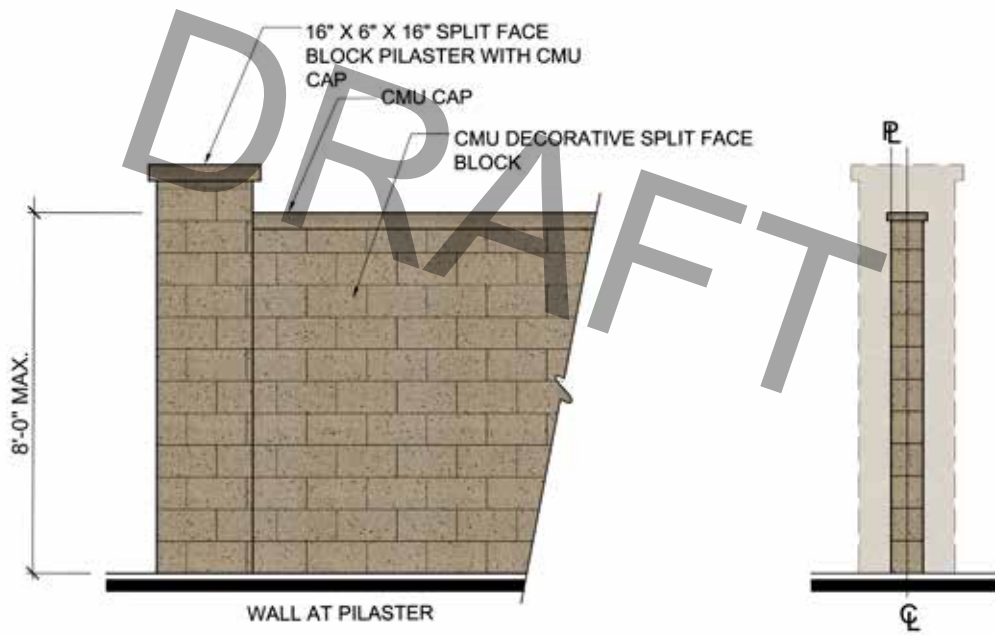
RESIDENTIAL CORNER LOT WALL
